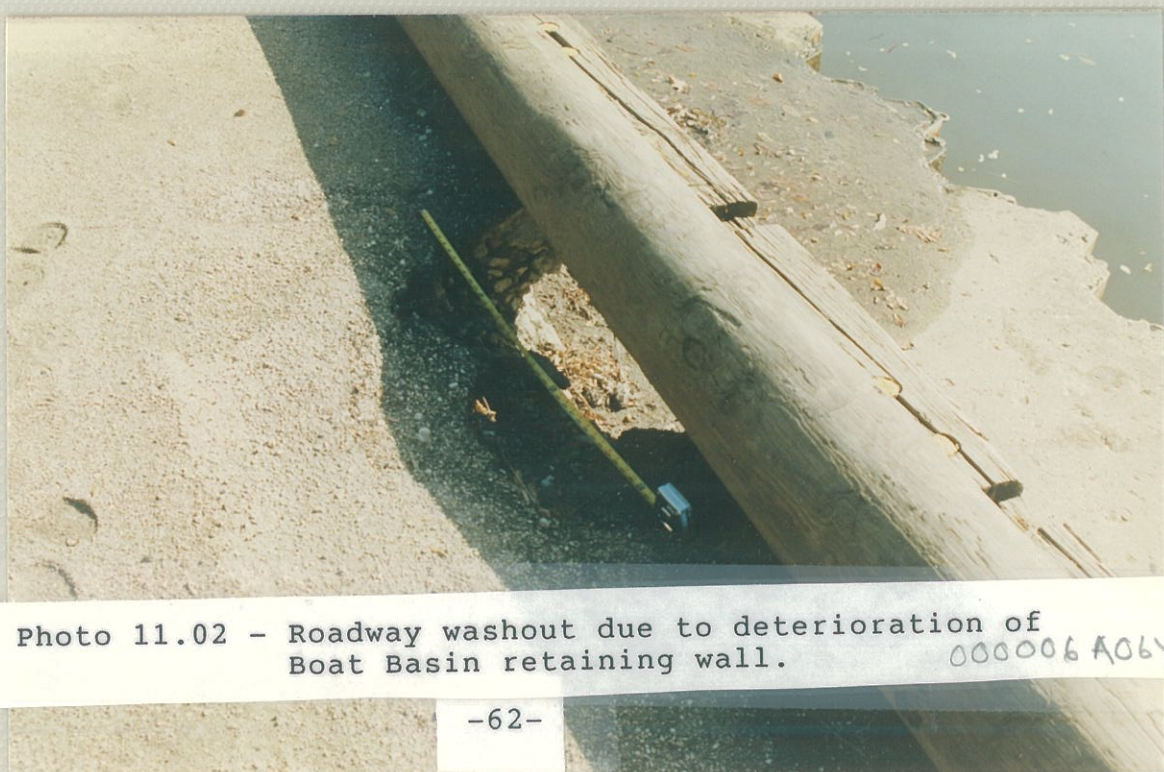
Roadway washout due to deterioration of Boat Basin retaining wall.
